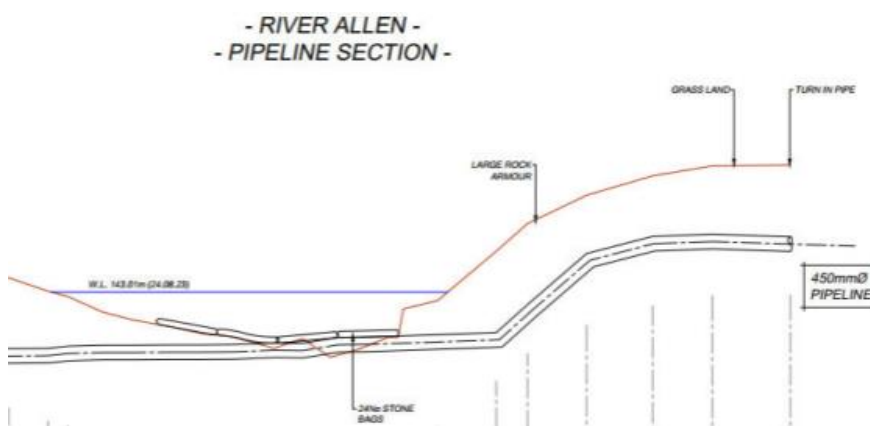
Emergency temporary protection works carried out in 2023 – cross-section view
